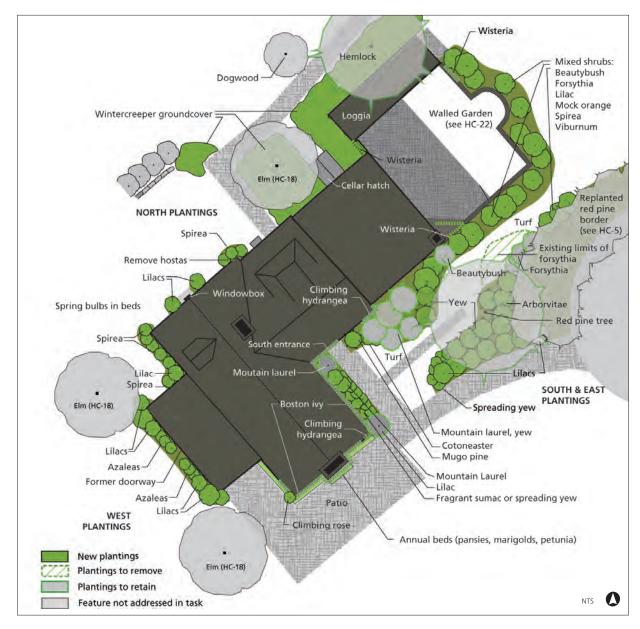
Conceptual planting plan for Stone Cottage. (SUNY ESF)
